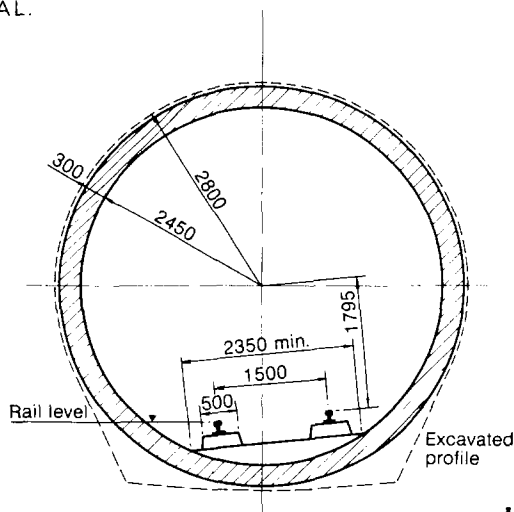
In situ concrete lining, 4.9 m i.d. (dimensions in millimetres)
